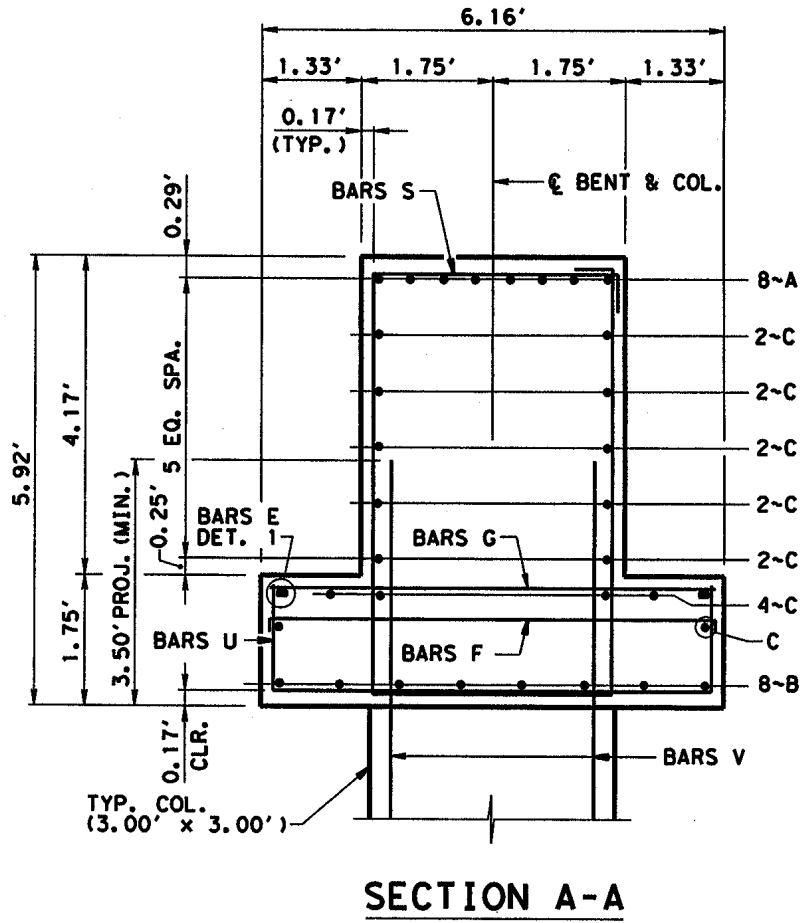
A section parallel to skewed end face in cantilever portion (see section A-A in Fig 6.2)
